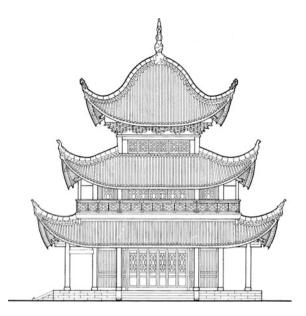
Side elevation of the Yueyang Tower. The three-story structure has a three-layer double-eaved helmet-shaped roof. An exterior corridor girds the second floor. In total, the structure measures 20.35 m in height. *Source* Yang (1993: 180)
